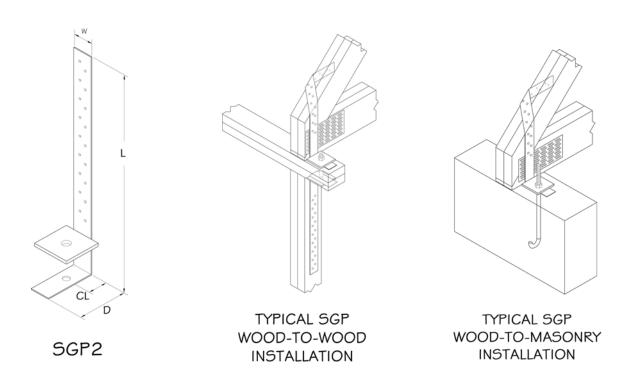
SGP STRAP TRUSS TIEDOWN
